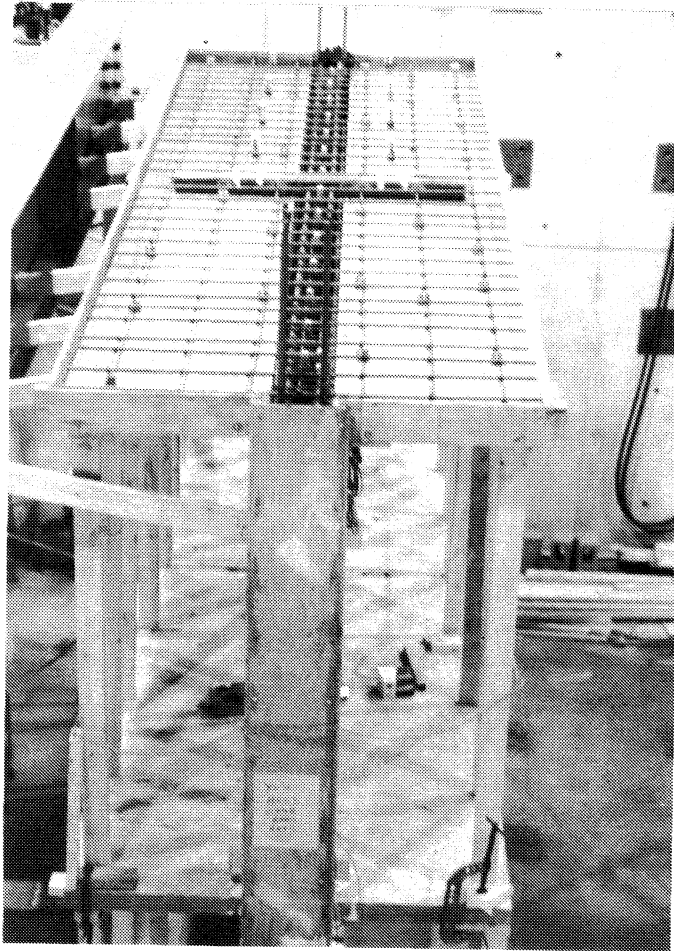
Second-Story Column and Beam Lateral Bracing
